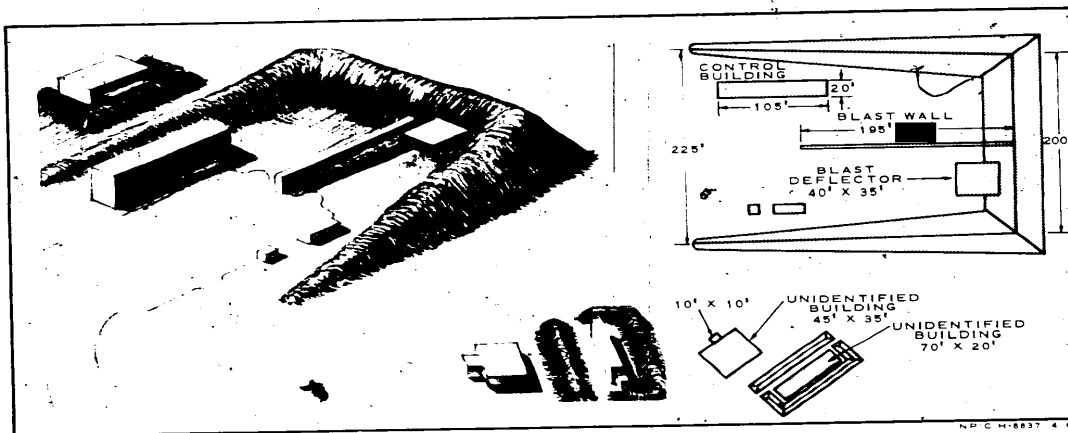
PLAN AND PERSPECTIVE VIEWS OF AIRCRAFT TEST REVETMENT, SHEN-YANG AIRFRAME PLANT 112.
